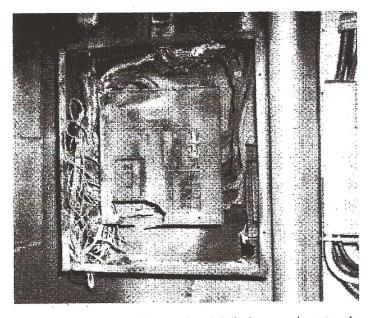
This circuit breaker panel exploded when a worker tripped a circuit breaker.
